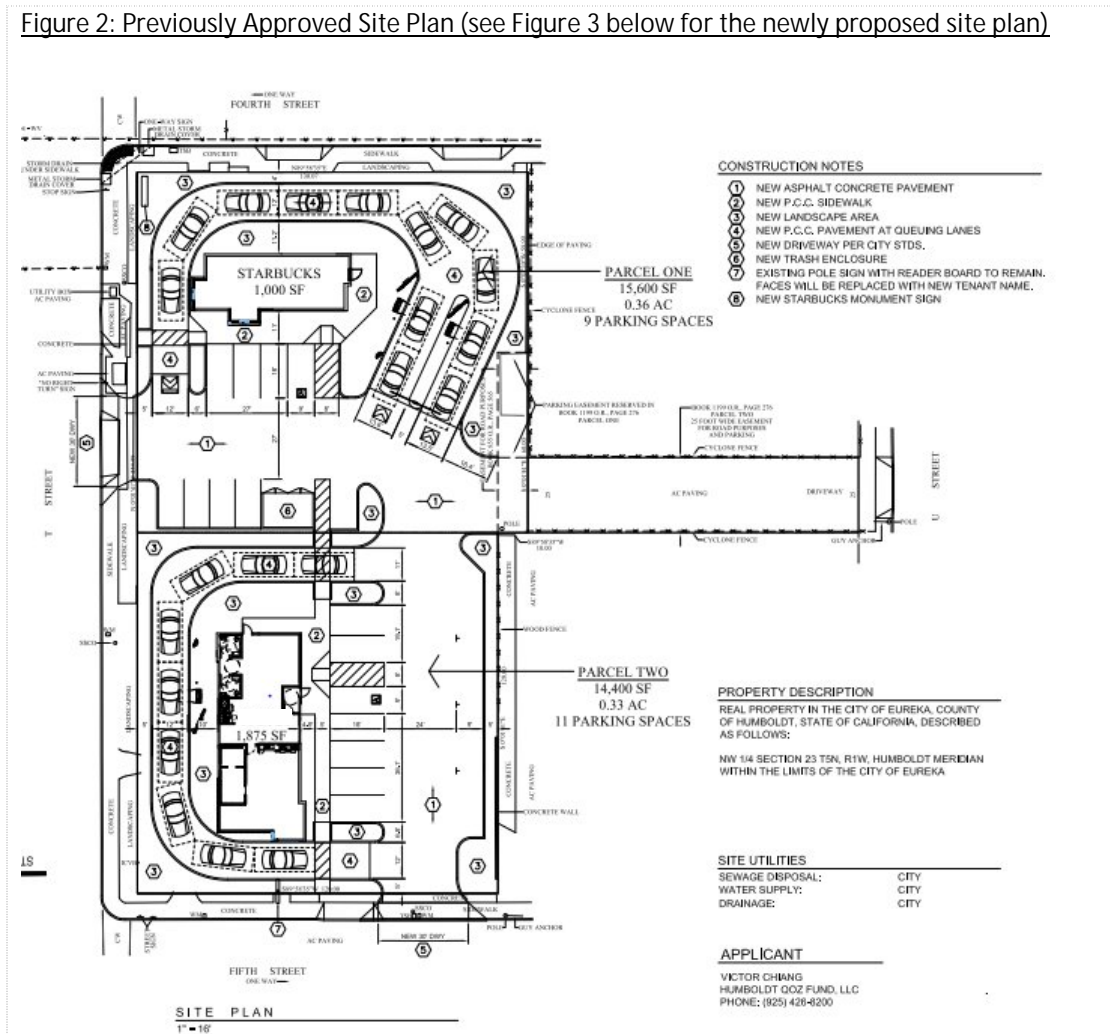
Previously Approved Site Plan (see Figure 3 below for the newly proposed site plan)
